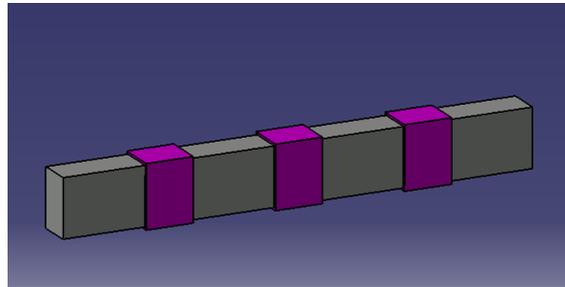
Strip reinforcement of concrete beams with TRM and FRCM materials
